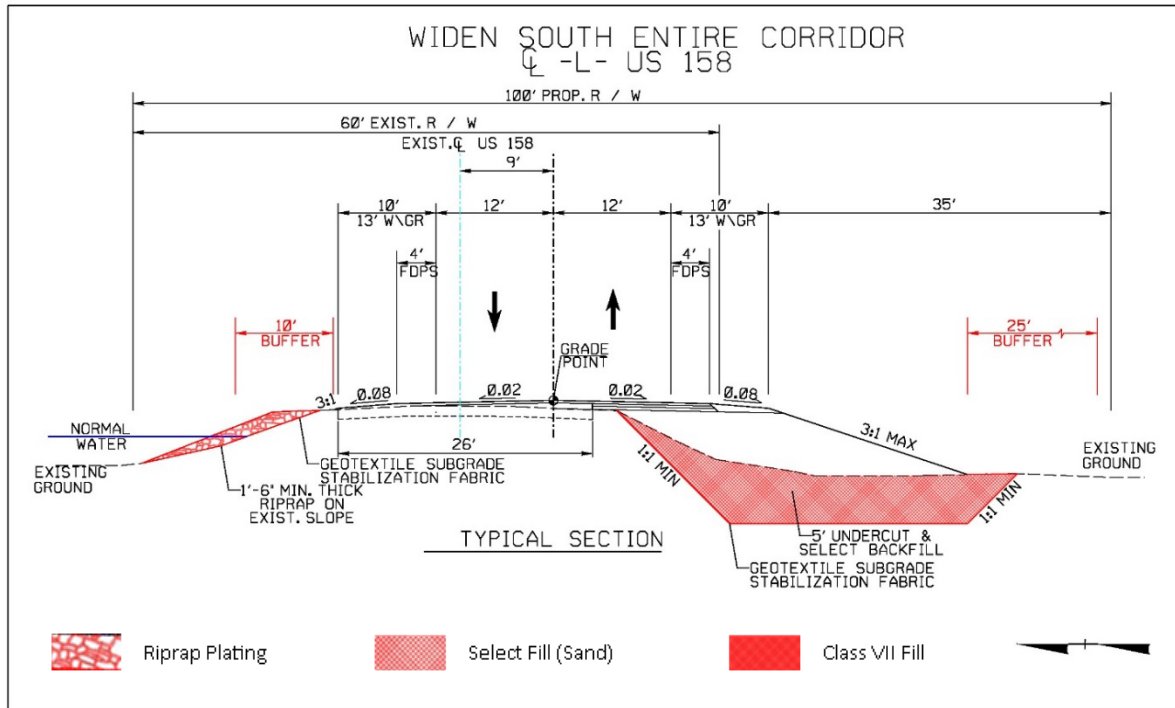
Alternative 1 Construction Methods and Undercut/Backfill Areas
